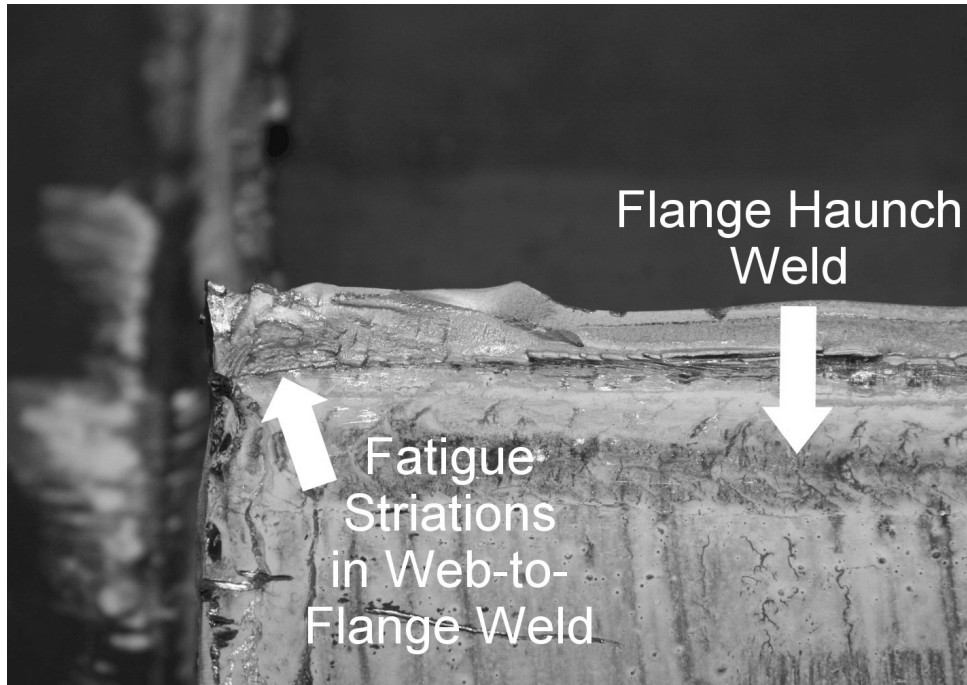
Fatigue Striations in Fracture Surface of Specimen X2L1.6
